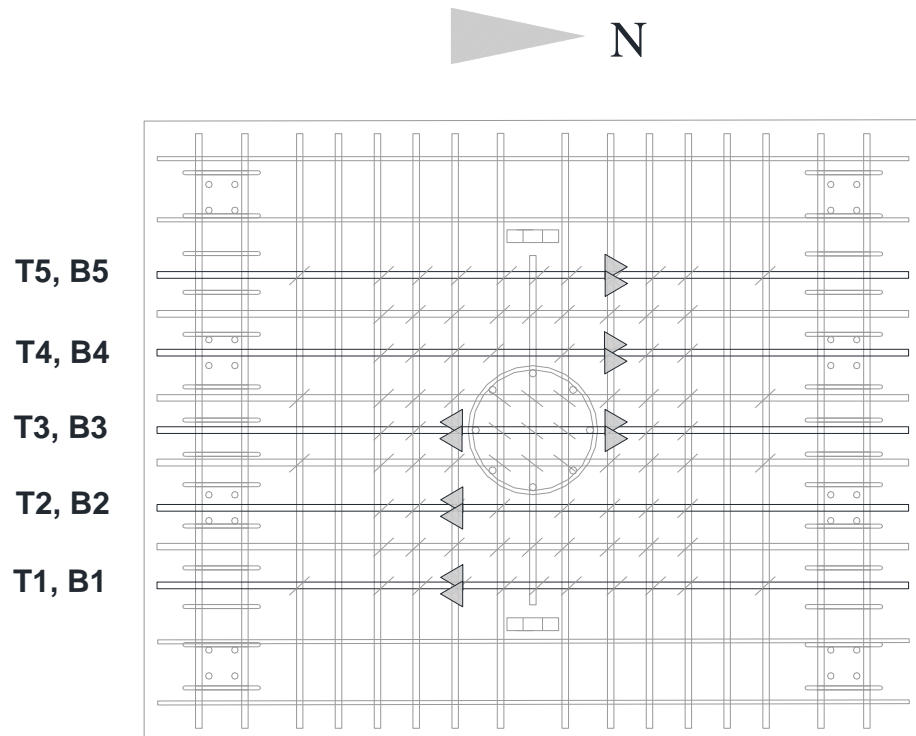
Strain gages on J-bars and vertical stirrups in the slab of Specimen #1
